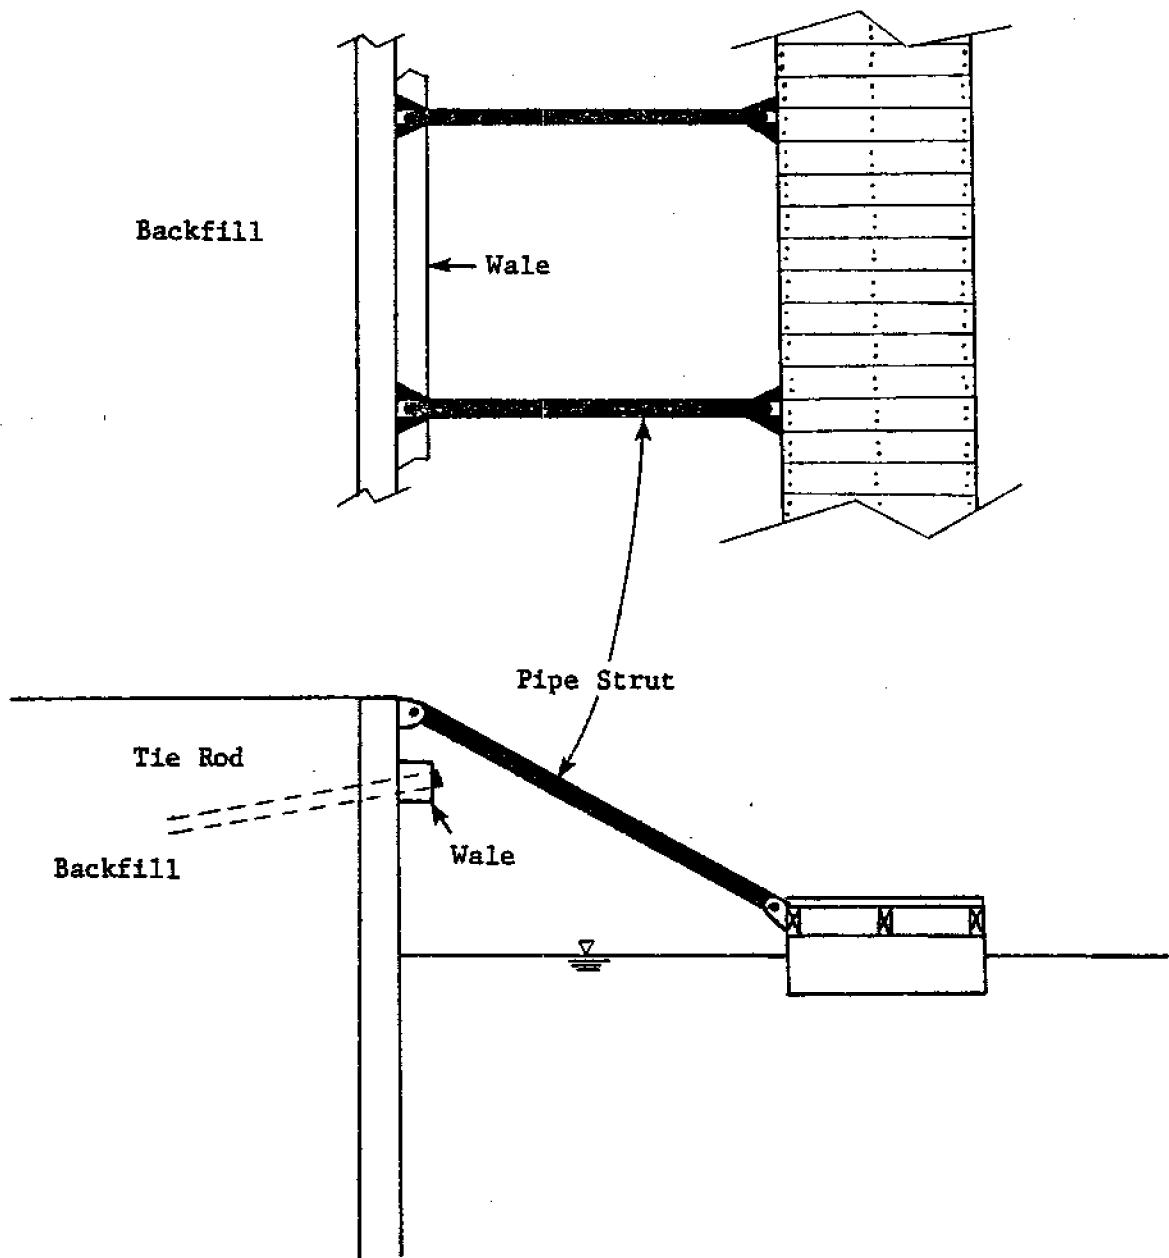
Pipe Strut or Stiff Arm Anchorage
